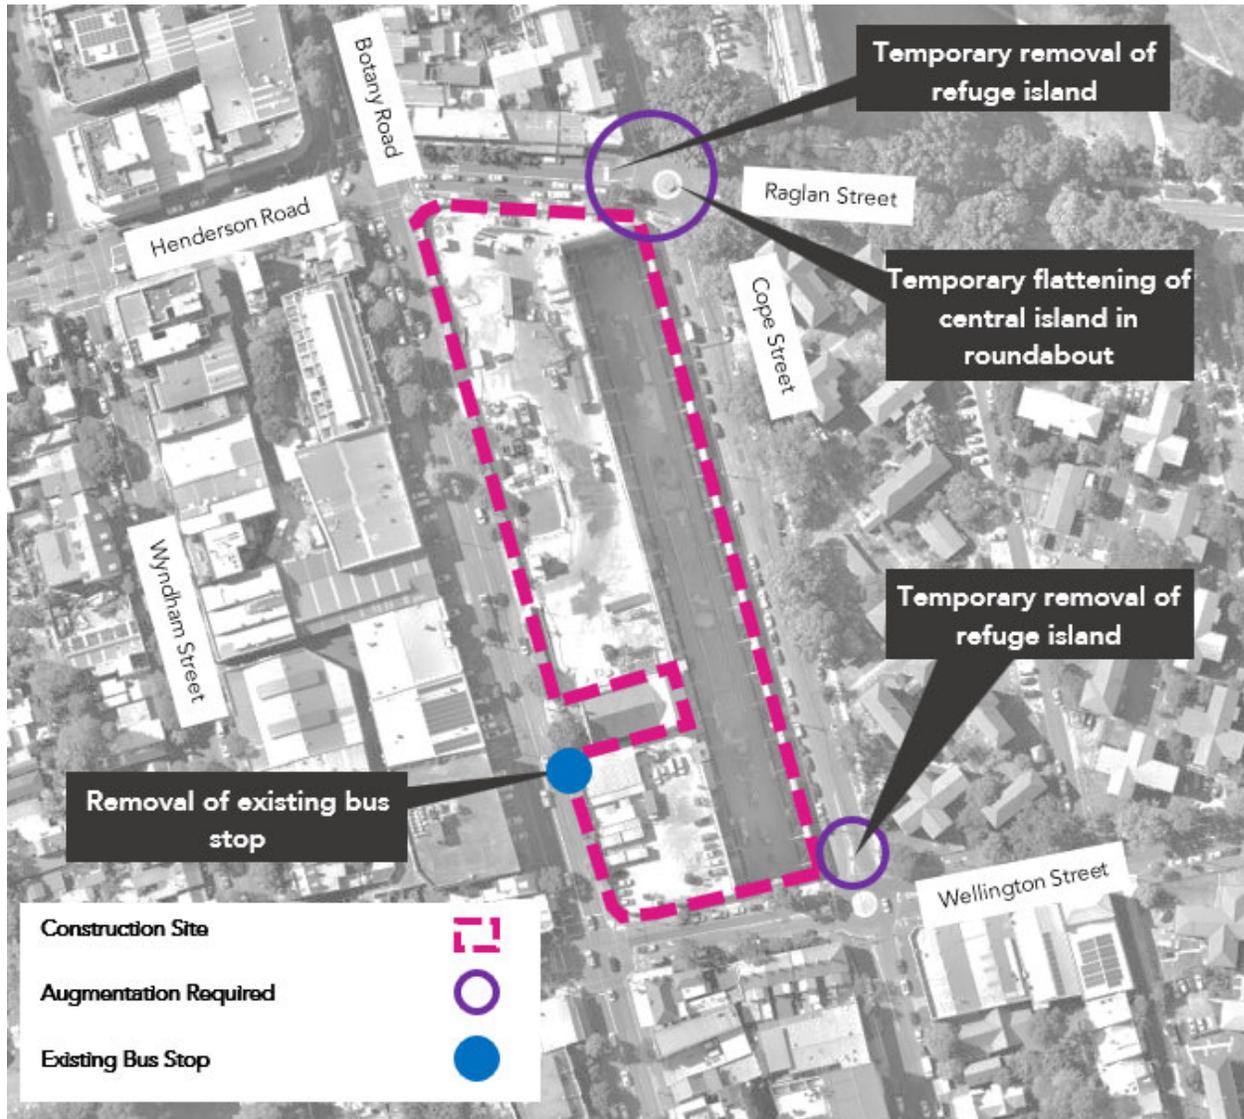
Temporary Augmentation of Intersections to facilitate Construction Vehicle Access/Egress for southern construction
